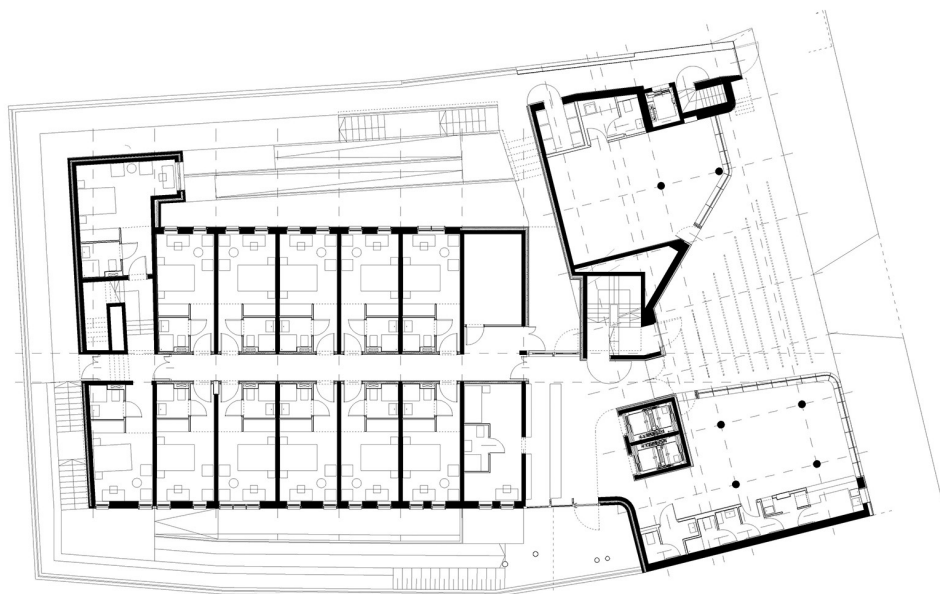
91 Starowińska St., INX Design Hotel. Ground floor plan. Own elaboration, based on (Lewicki&Łatak, 2017)
